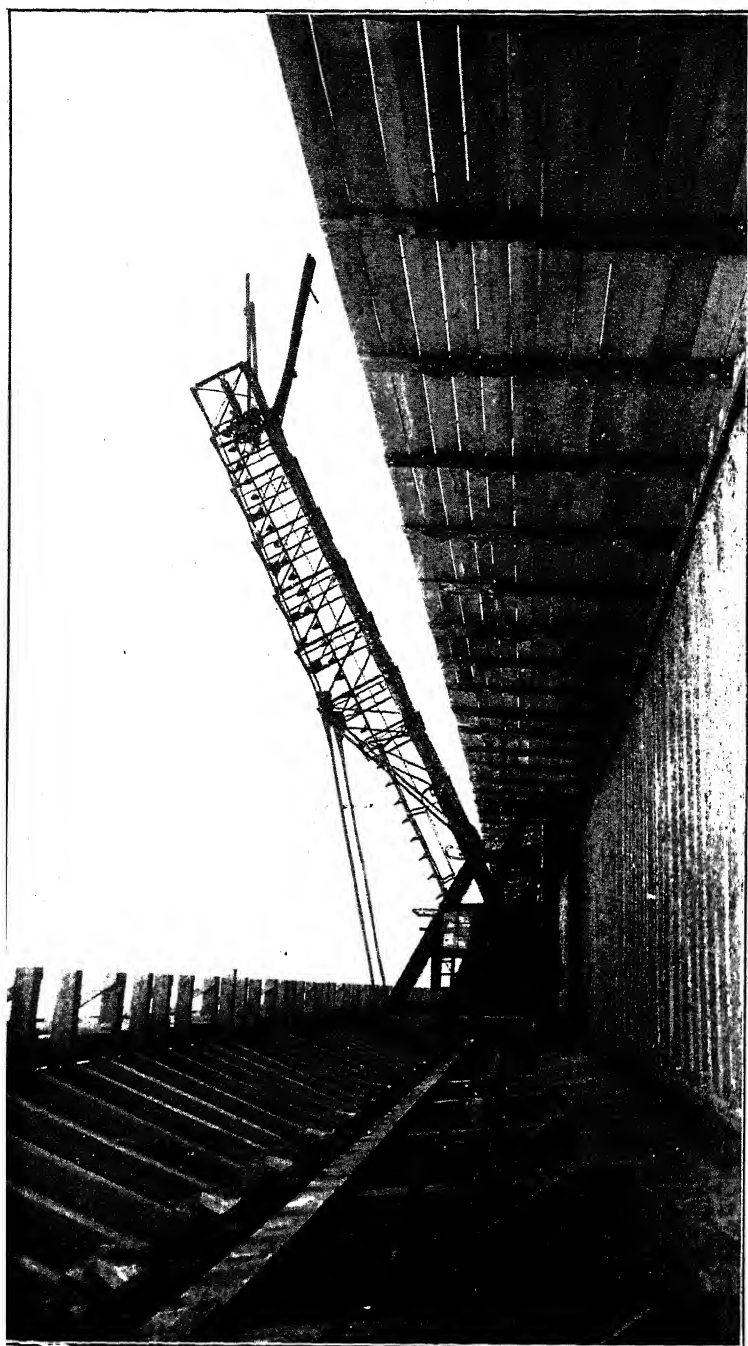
TRAVELING CANTILEVER-TRIMMER, HUDSONDALE STORAGE-PLANT. SHOWING FACE OF TRESTLE AND BULKHEAD.
